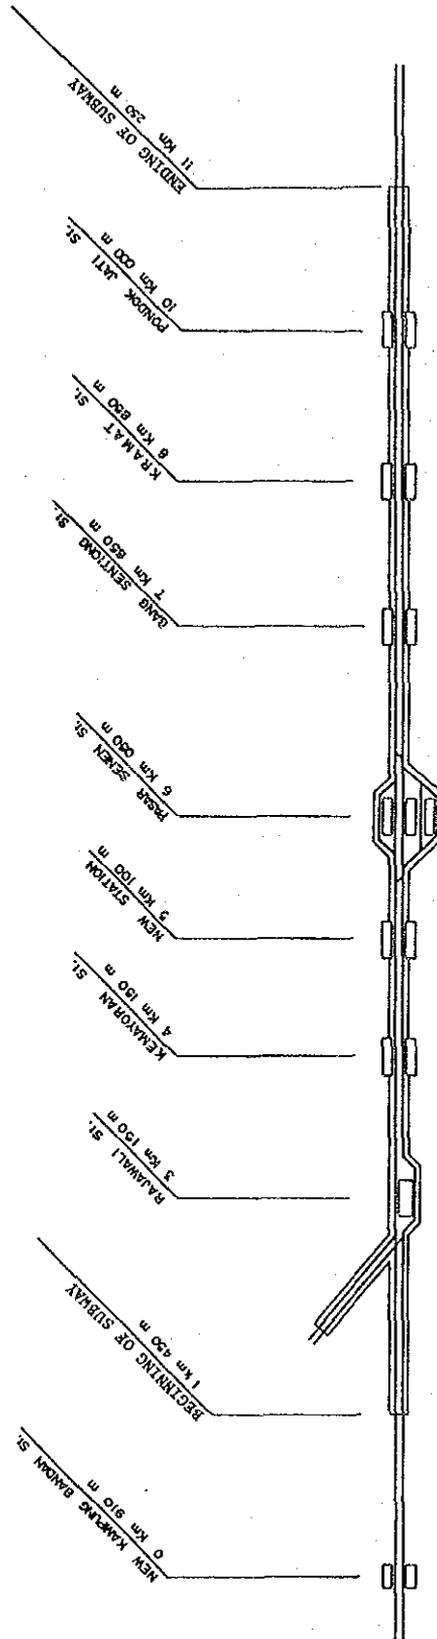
Track Layout Plan for Subway of E/L
